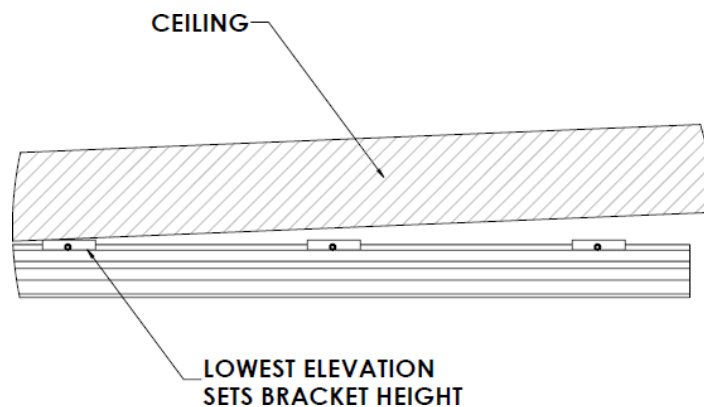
Figure 17: Bracket Elevations for Level Track
